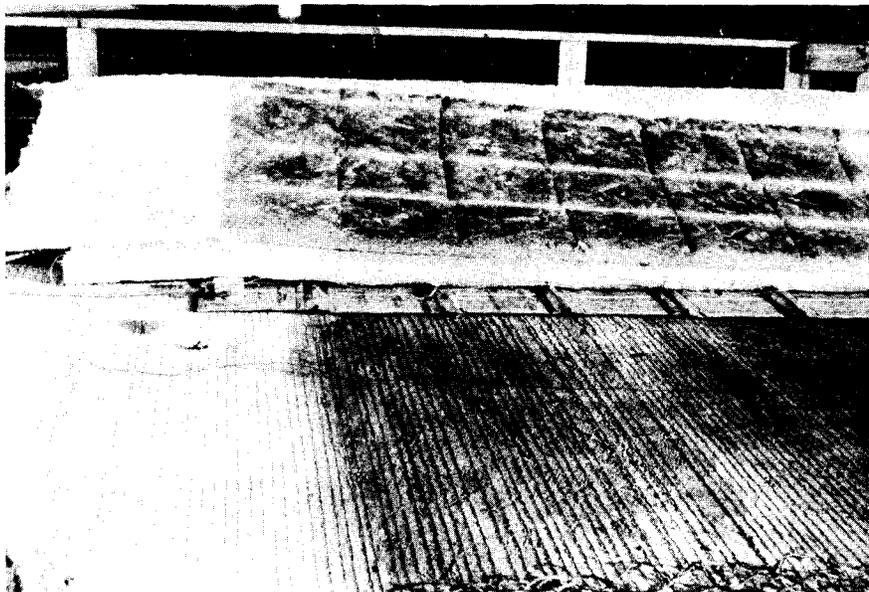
Transition on deck between unheated concrete (left) and darkened, heated concrete (right).
